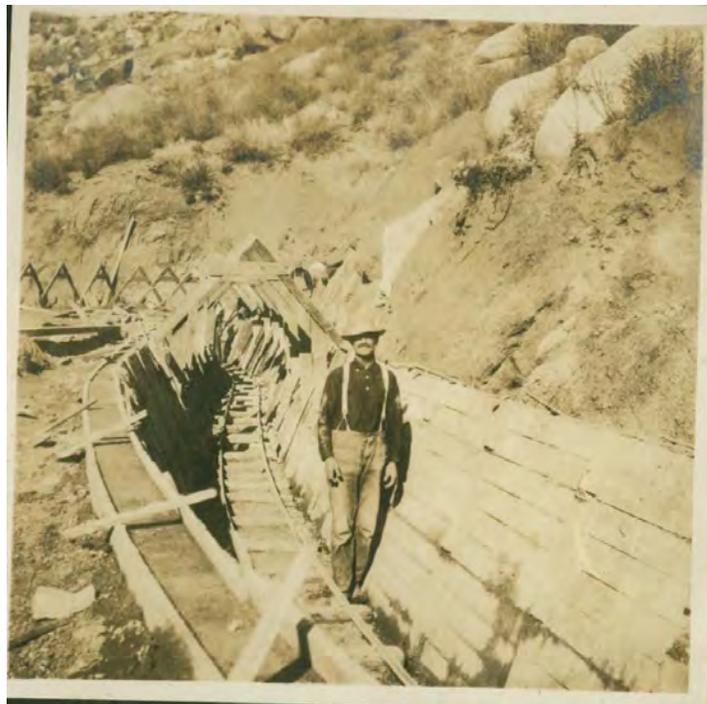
Photograph showing pouring of Dulzura Conduit concrete canals, 1907 (M.M. O'Shaughnessy Photograph Collection, NUI Galway Digital Collections)
